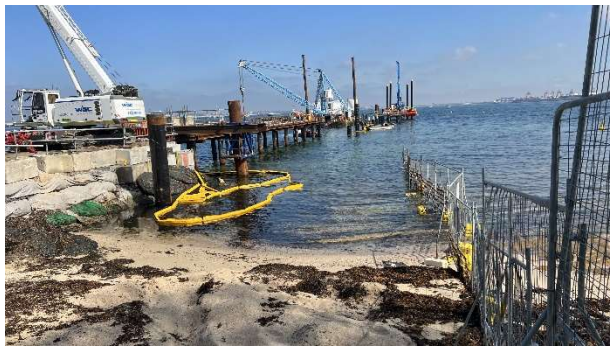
and K9b: Crane platform over water. Steel track and oil absorbent mats use to control potential hydraulic oil leakage. Spill kit strategically located.
